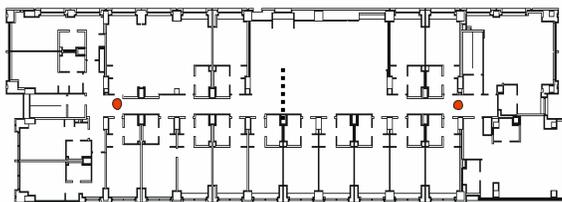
2 nodes in hallway of 1st floor – Configuration 1
